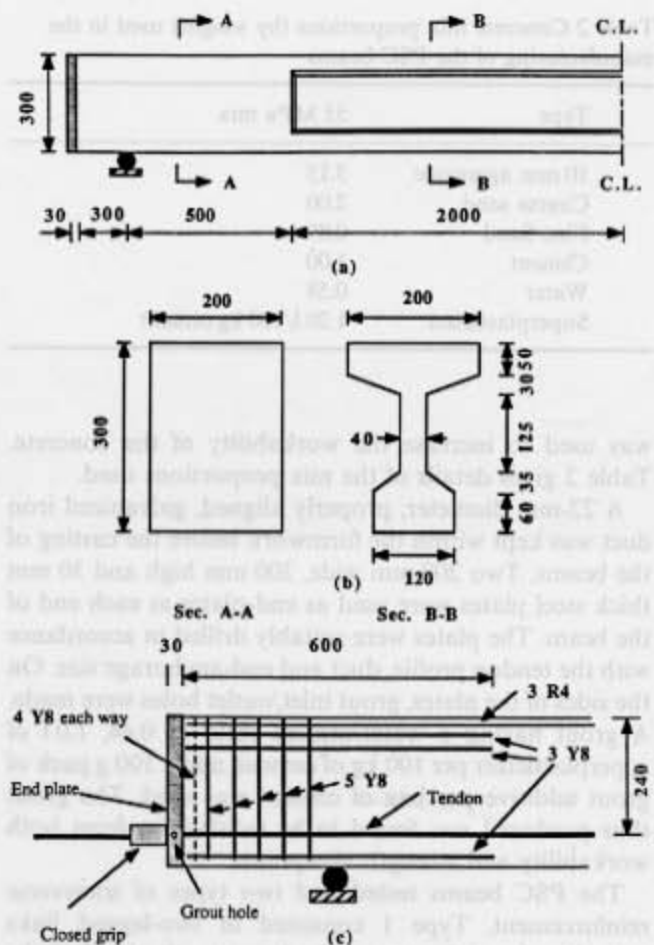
(a, b) Cross-sectional characteristics and (c) reinforcement details of end-zones of the prestressed concrete beams tested in the programme (all dimensions and bar sizes are in mm).
